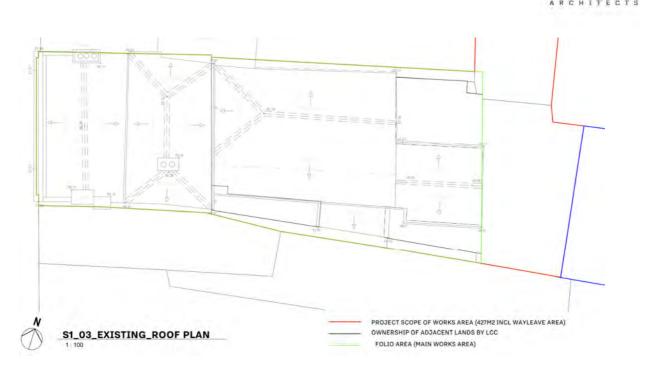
Existing Survey at Roof level -refer to Appendix H
